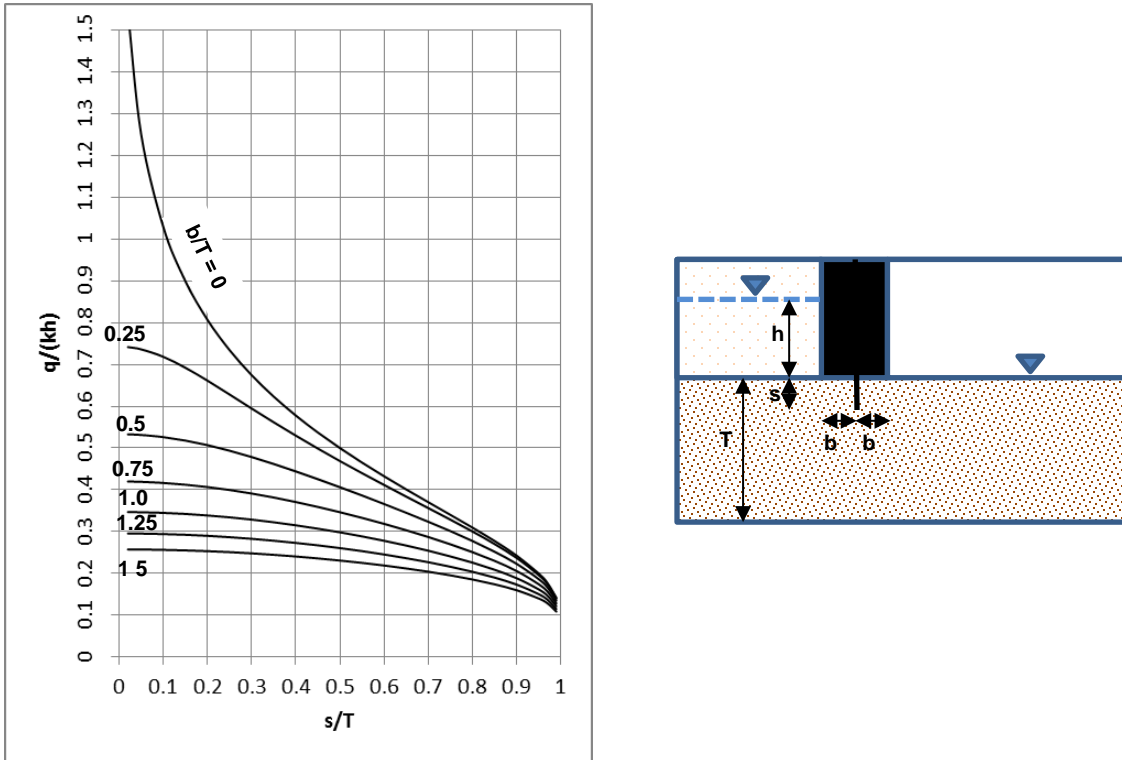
Cut off wall to reduce seepage to an excavation (see Harr 1962 after Polubarinova-Kochina 1952)
